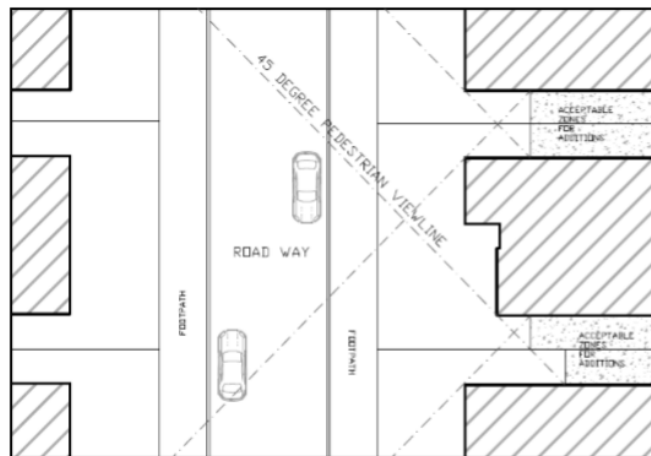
acceptable areas for ground level additions are sited within the area created by drawing a 45 degree view line from the opposite footpath through the front corner of the subject building and the corners of adjacent buildings.
